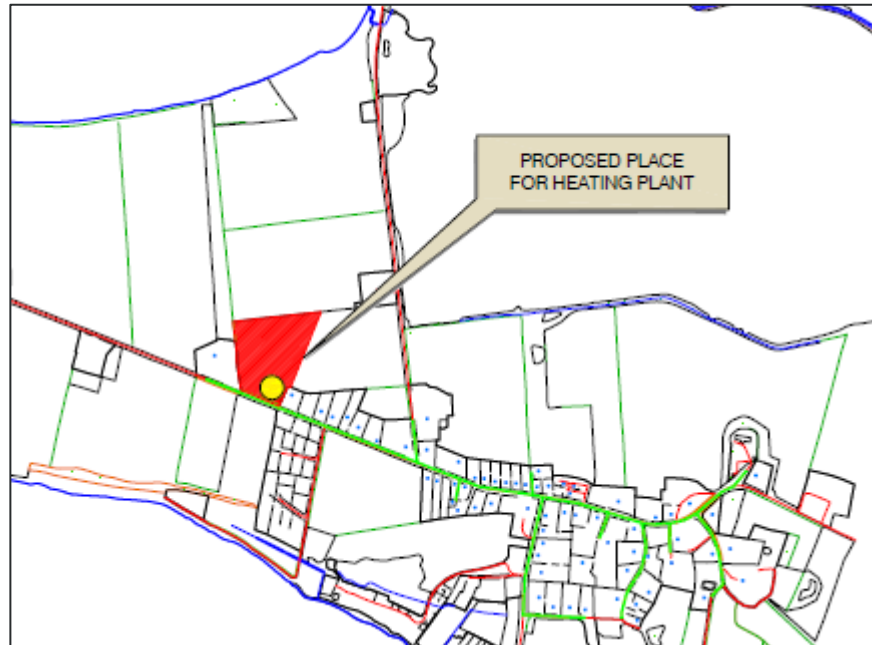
\_3: Proposed District Heating floor plan. In green it is highlighted the network
